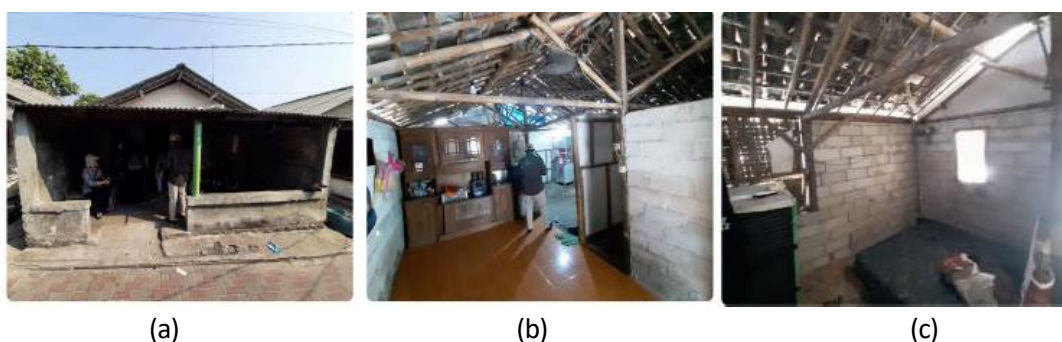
(a) front of the house (b) family room (c) bedroom to the front view (source: author)
